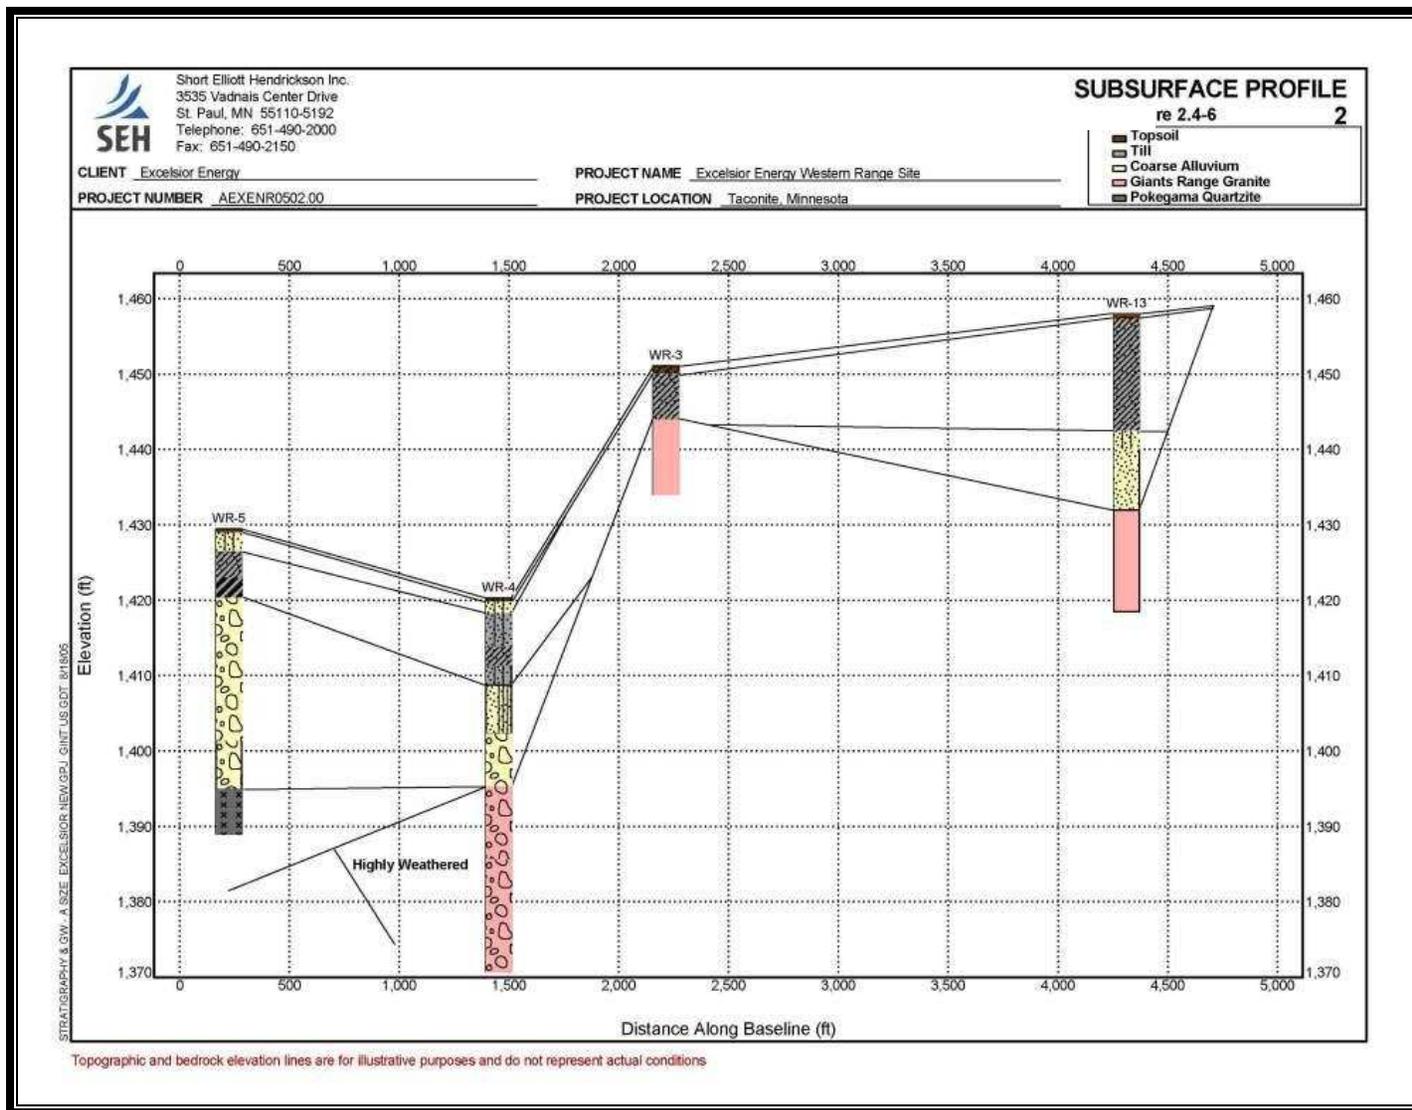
Subsurface Profile of Cross Section “3-3”
